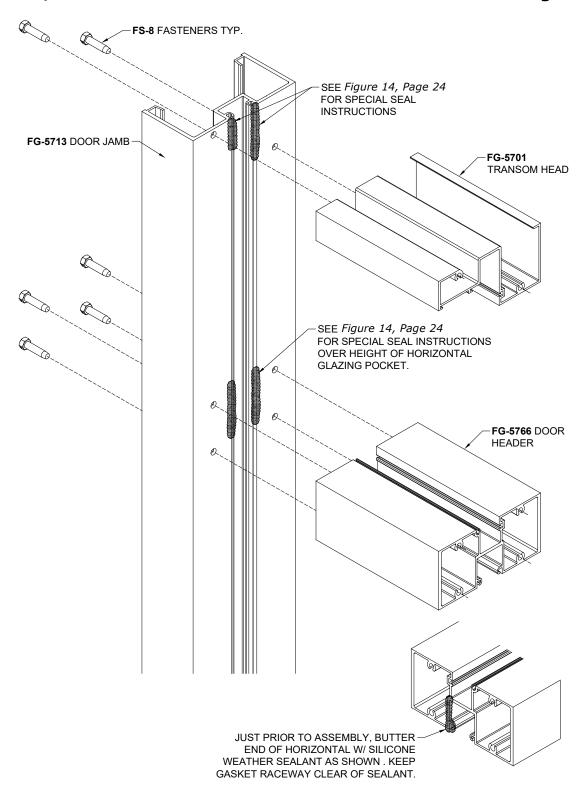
FG-5700 StormMax® Door Frame Assembly Option 1
